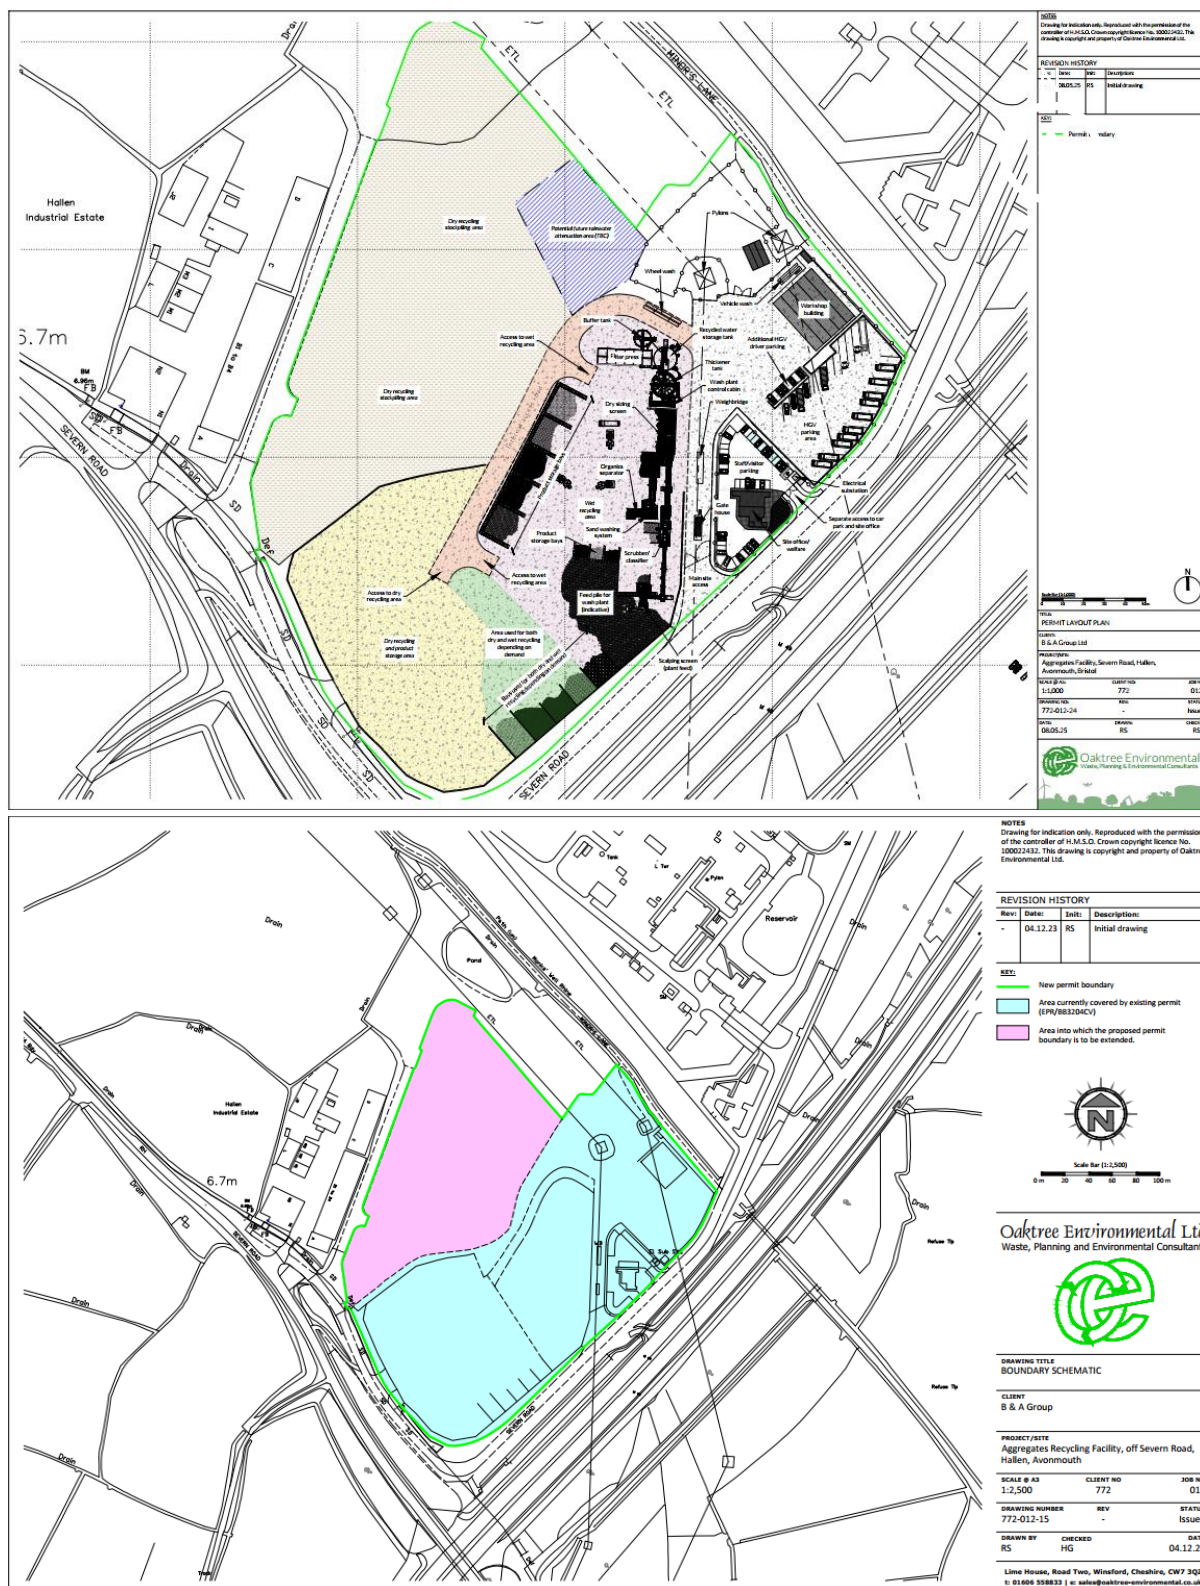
Proposed Site Plans & Permit Boundary Extension
